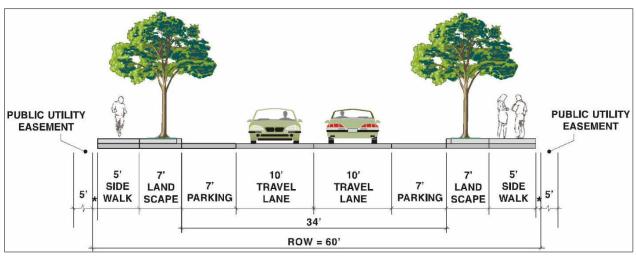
G – Local Residential Street with Parking Both Sides, 60 Foot Right-of-Way
